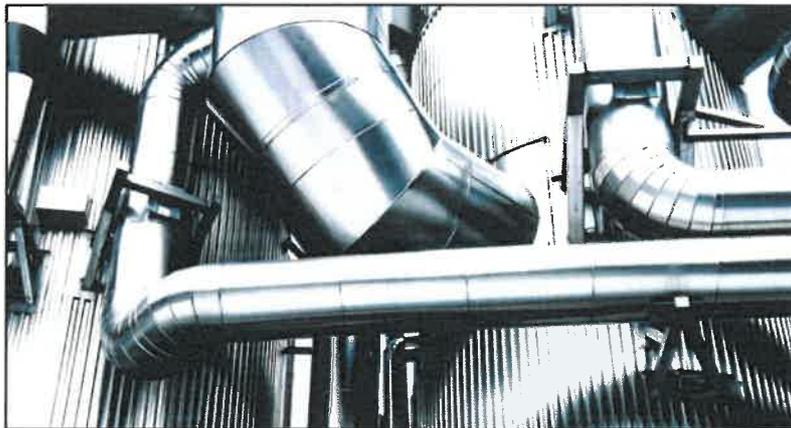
Design and Construction of Onshore Receiving and Processing Facilities
